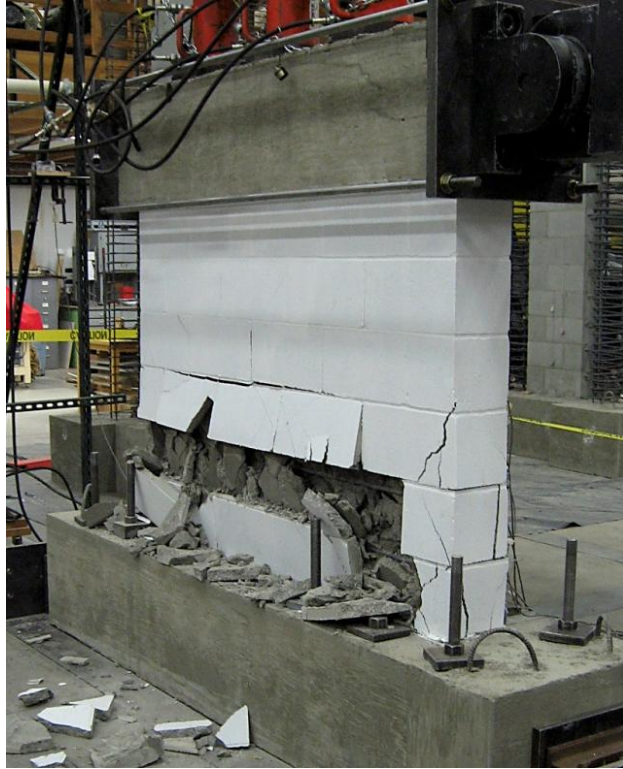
Wall C4: Spalling of Face Shells
